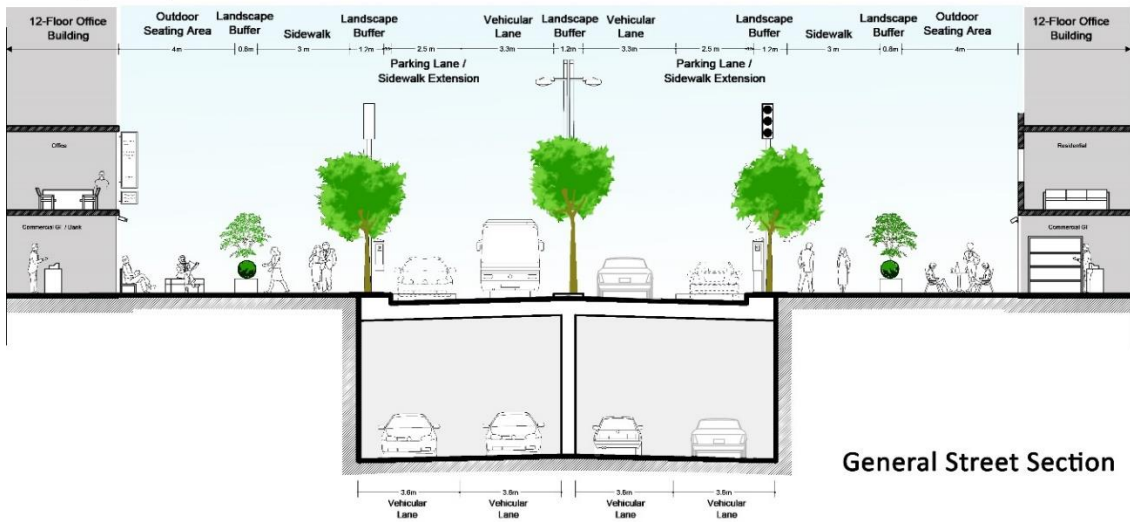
[“Bechara El Khoury” Existing and Proposed Street Sections], Al Asmar 2018
